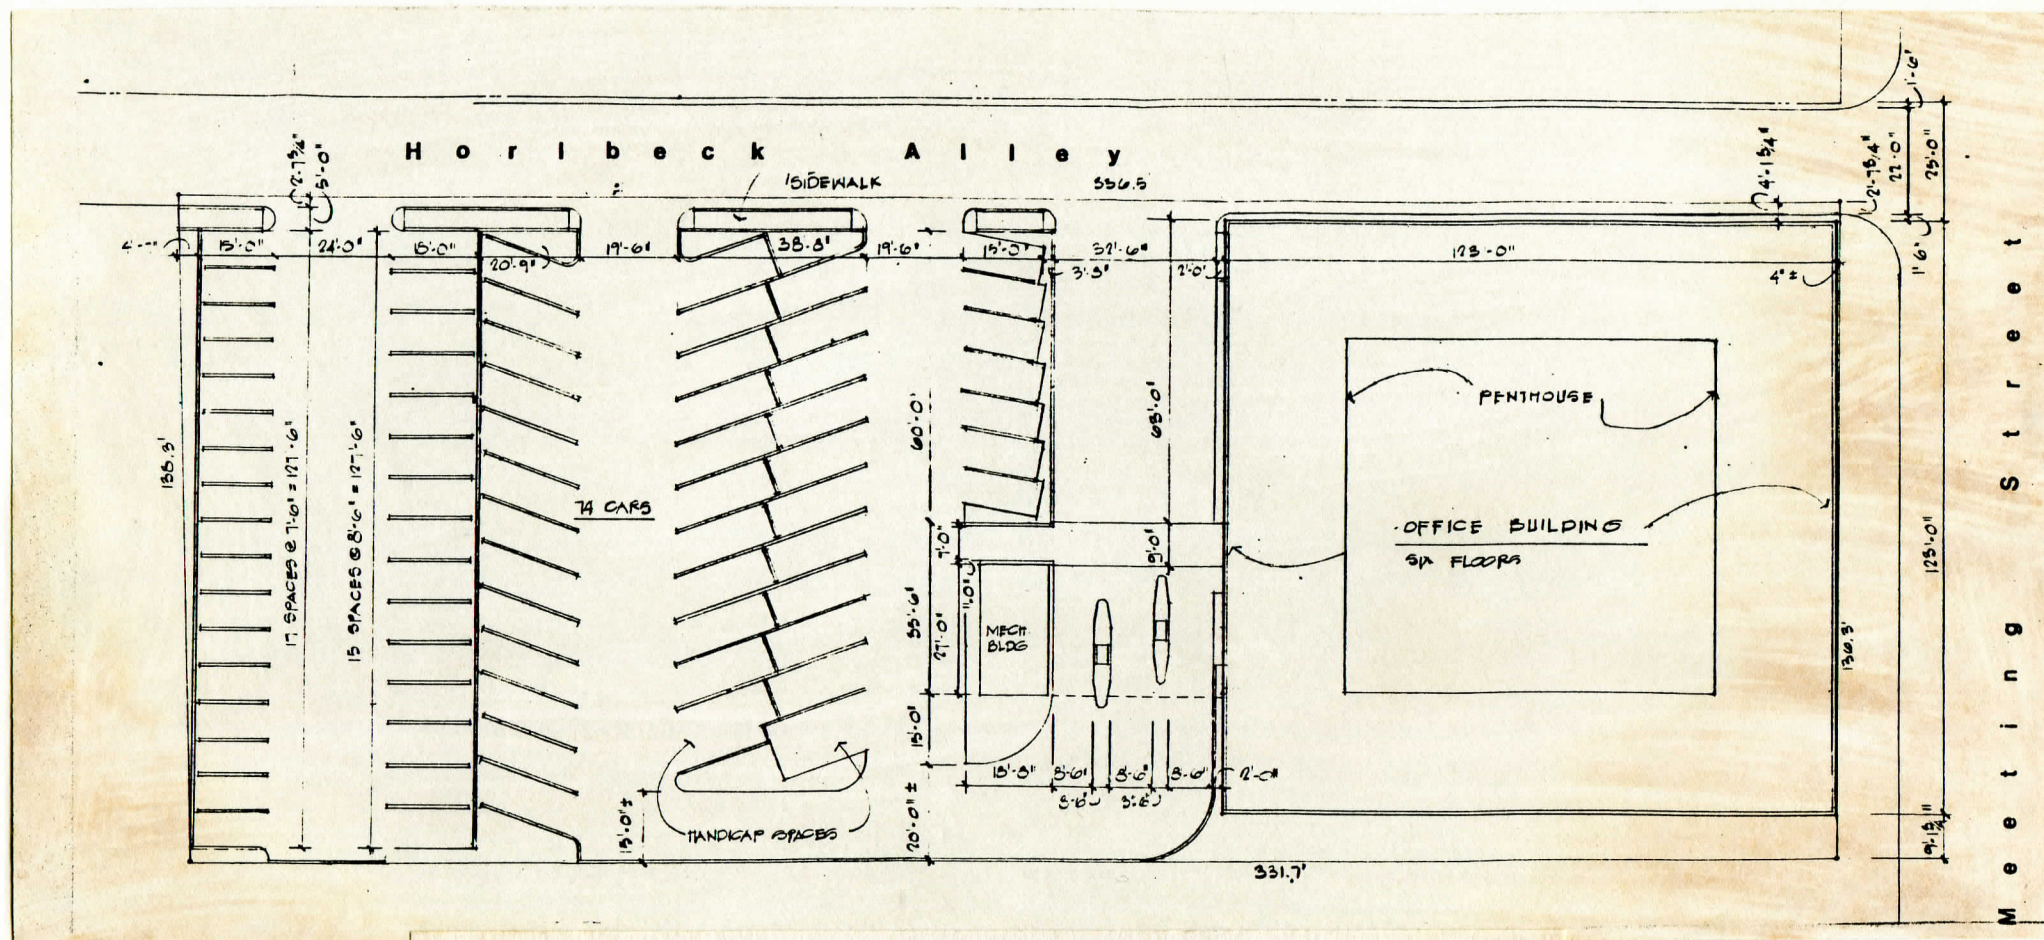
Plan of the Meeting Street Office Building Site showing the proposed buildings.
